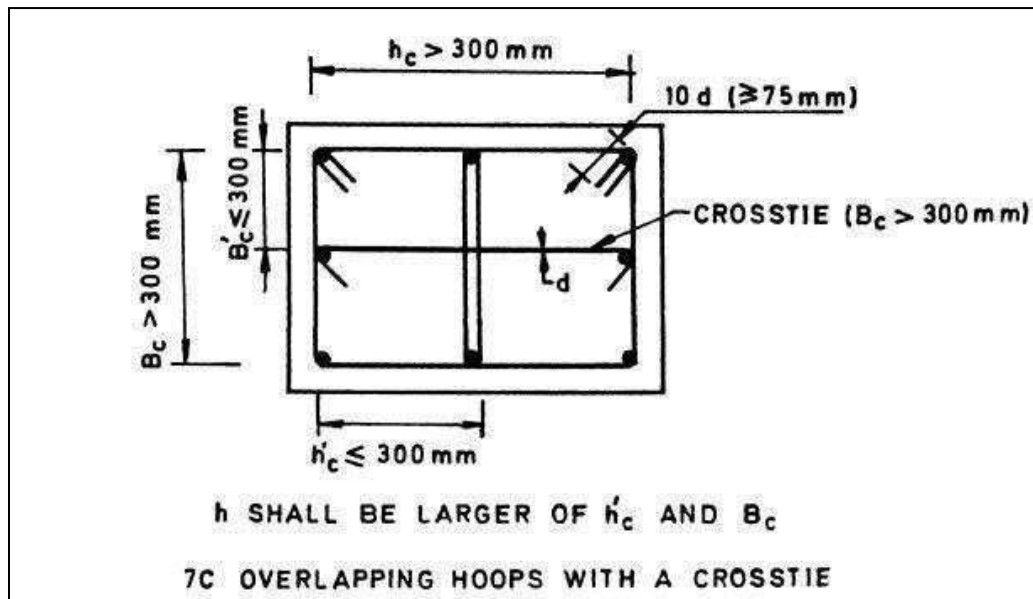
Shear Reinforcement in beams as per IS 13920 (2002)
